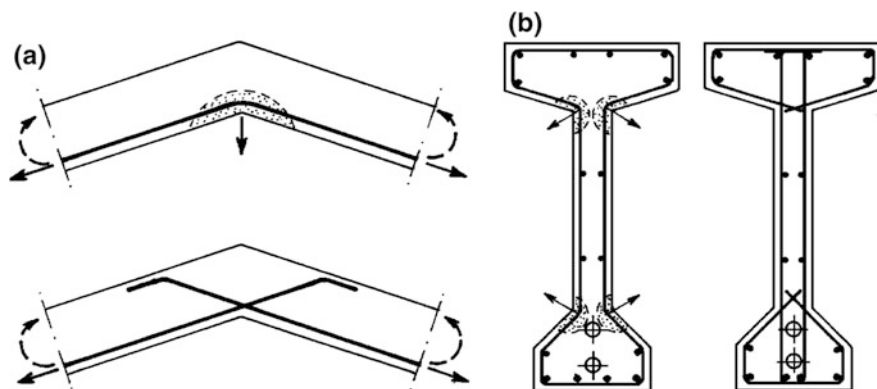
Bad and good reinforcement details: knee beam (a) and PC section (b)
